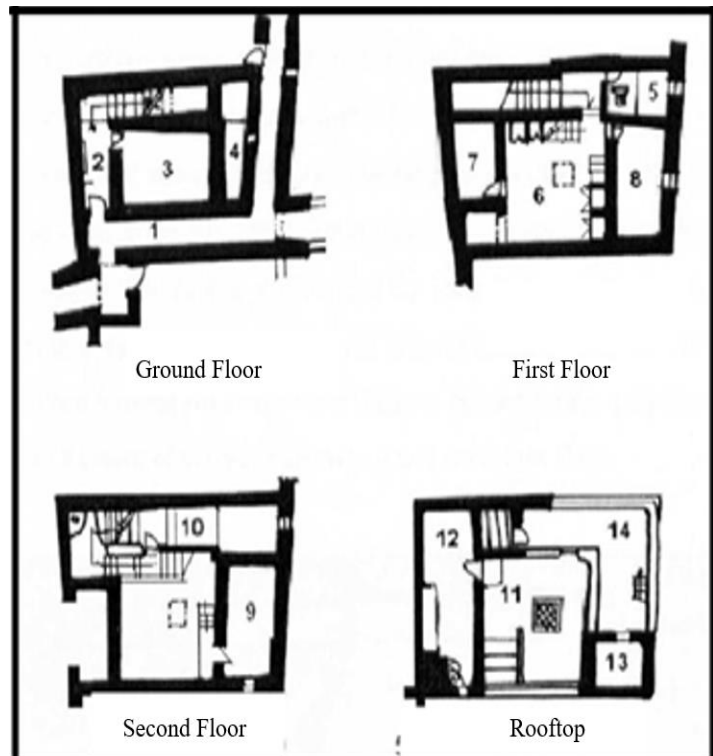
The traditional housing unit style of old town Ghadames (Chojnacki 2003)
